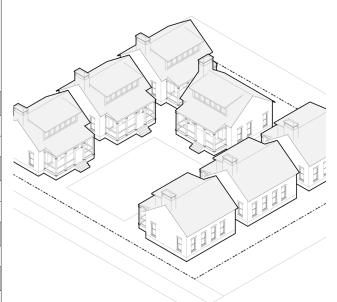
N: Examples of COTTAGE COURT Buildings:
